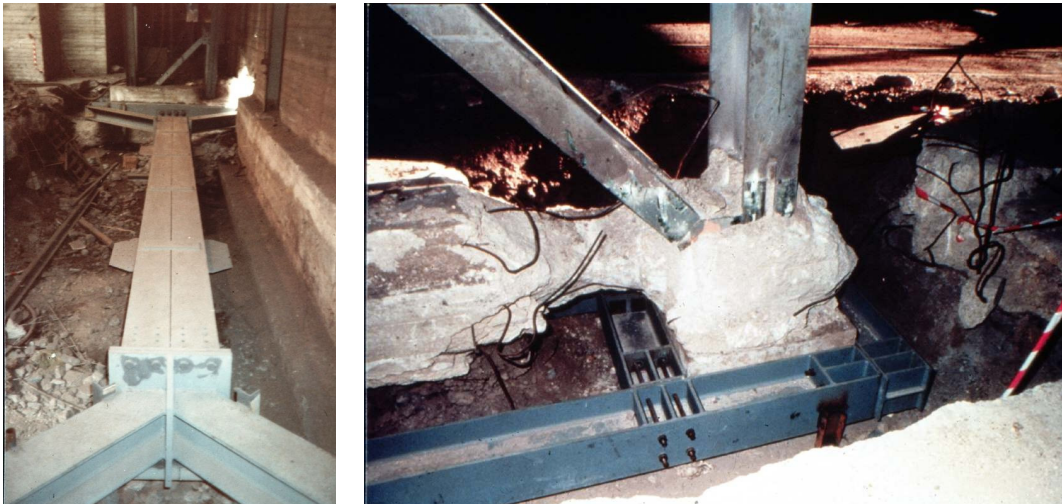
The connecting structures at the foundation level (Mazzolani) [159] by courtesy of F.M. Mazzolani
